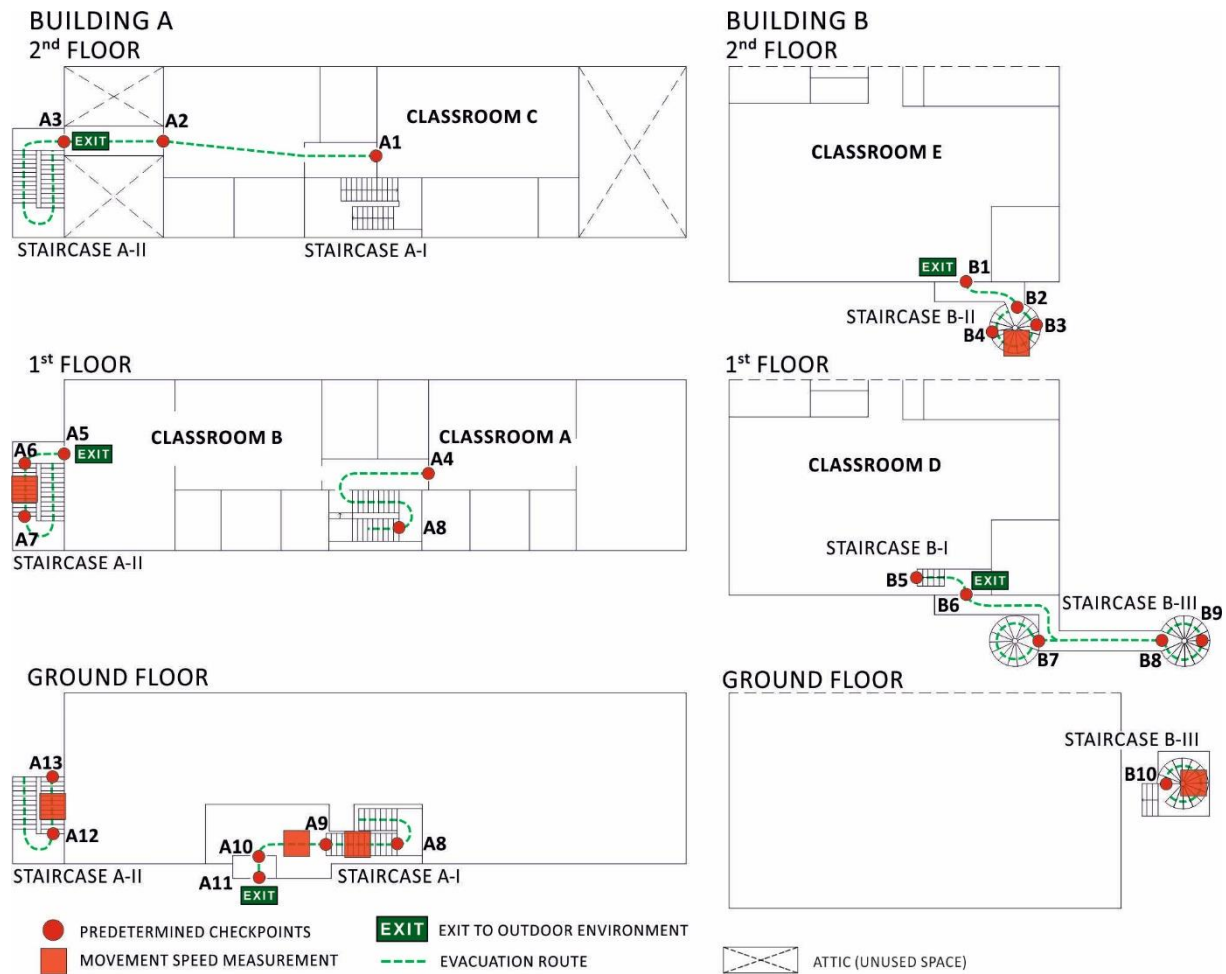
Layout of the pre-school buildings with a description of the escape routes and checkpoints
